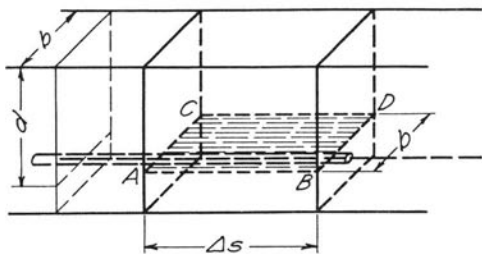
SECTION OF BEAM SUBJECTED TO SHEARING STRESSES
